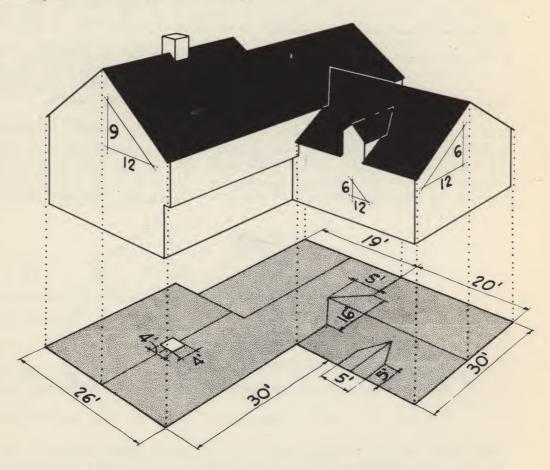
Typical Dwelling Roof Shown in Perspective and Plan.
